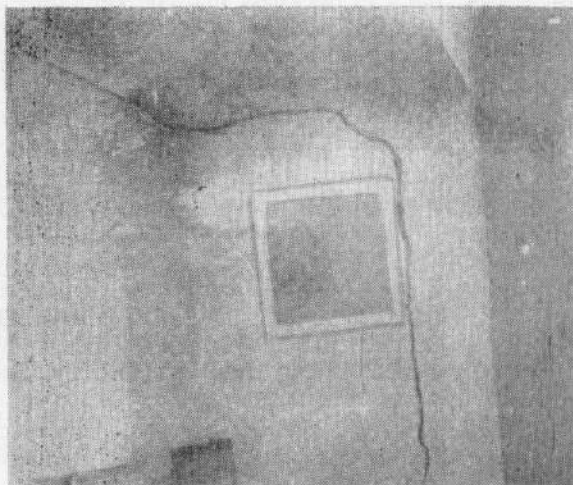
Movement of the western end wall at the second storey level of the Administrative Building of the Bharat Earth Movers Limited with development of 2.5 to 3 cm. wide cracks in the wall.
